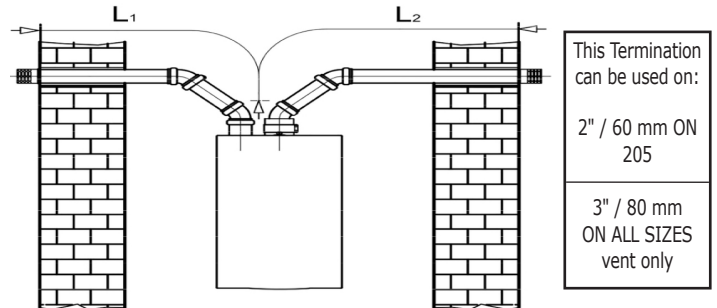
2"/60 mm & 3"/80 mm Twin Pipe Separated Horizontal Flue Termination
